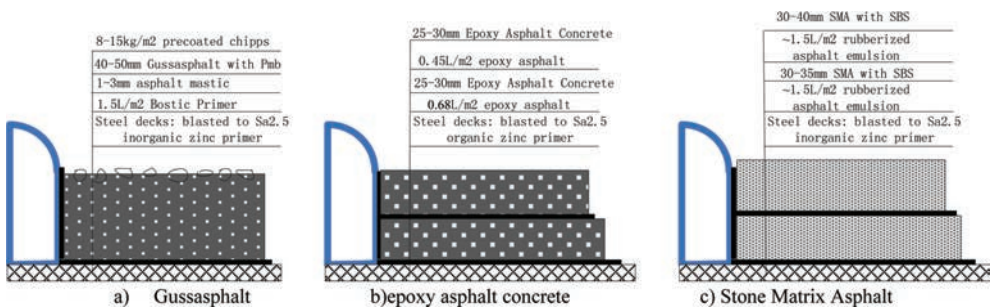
Basic pavement structures for long-spanned steel bridge decks in China.
